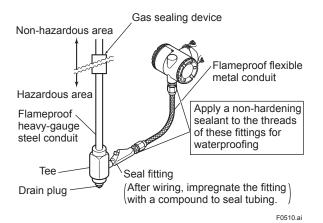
Typical Wiring Using Flameproof Metal Conduit
